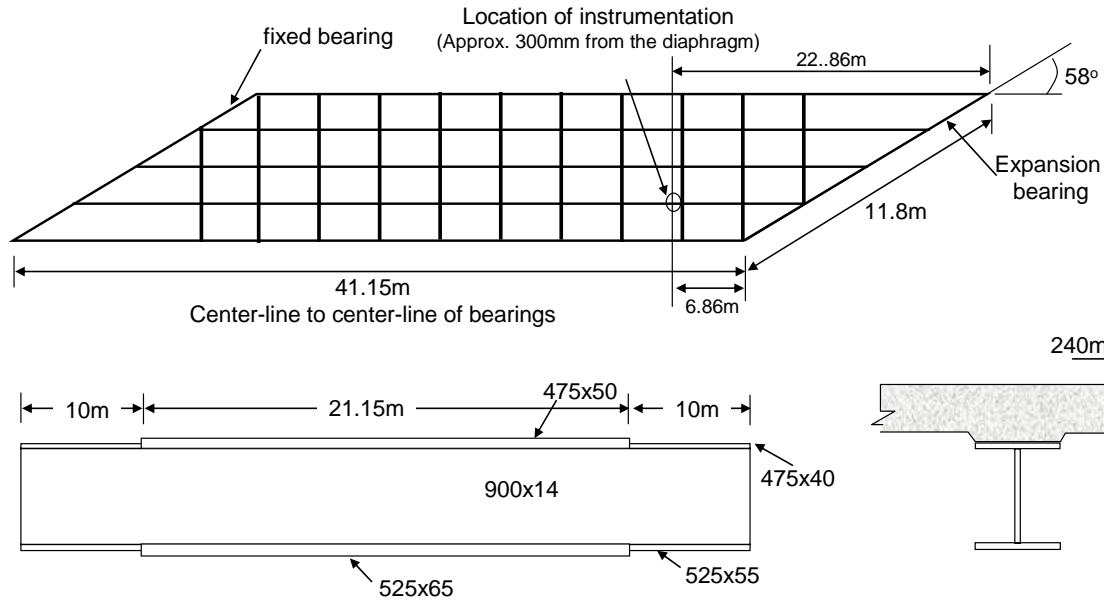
Plan view of the bridge deck slab, elevation of the steel girder and the cross-section of the composite bridge section.
